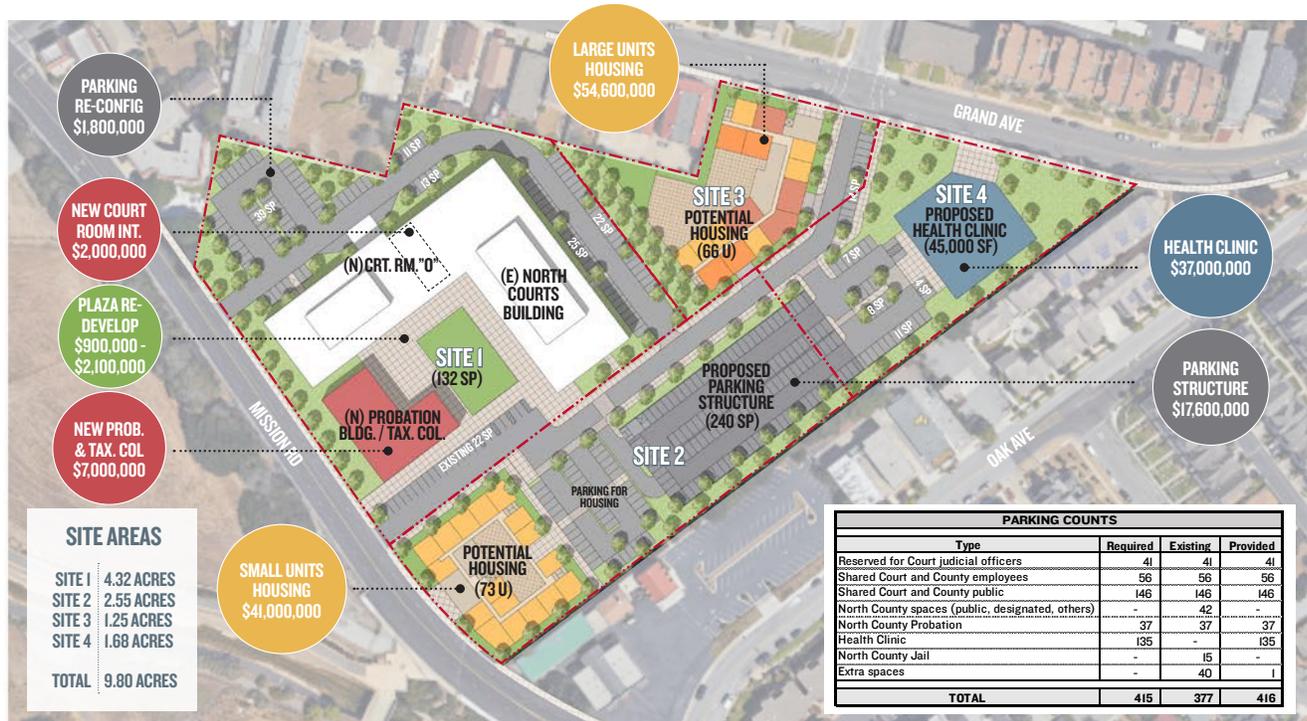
Option 3. Mission Road Housing / Grand Avenue Clinic Location
